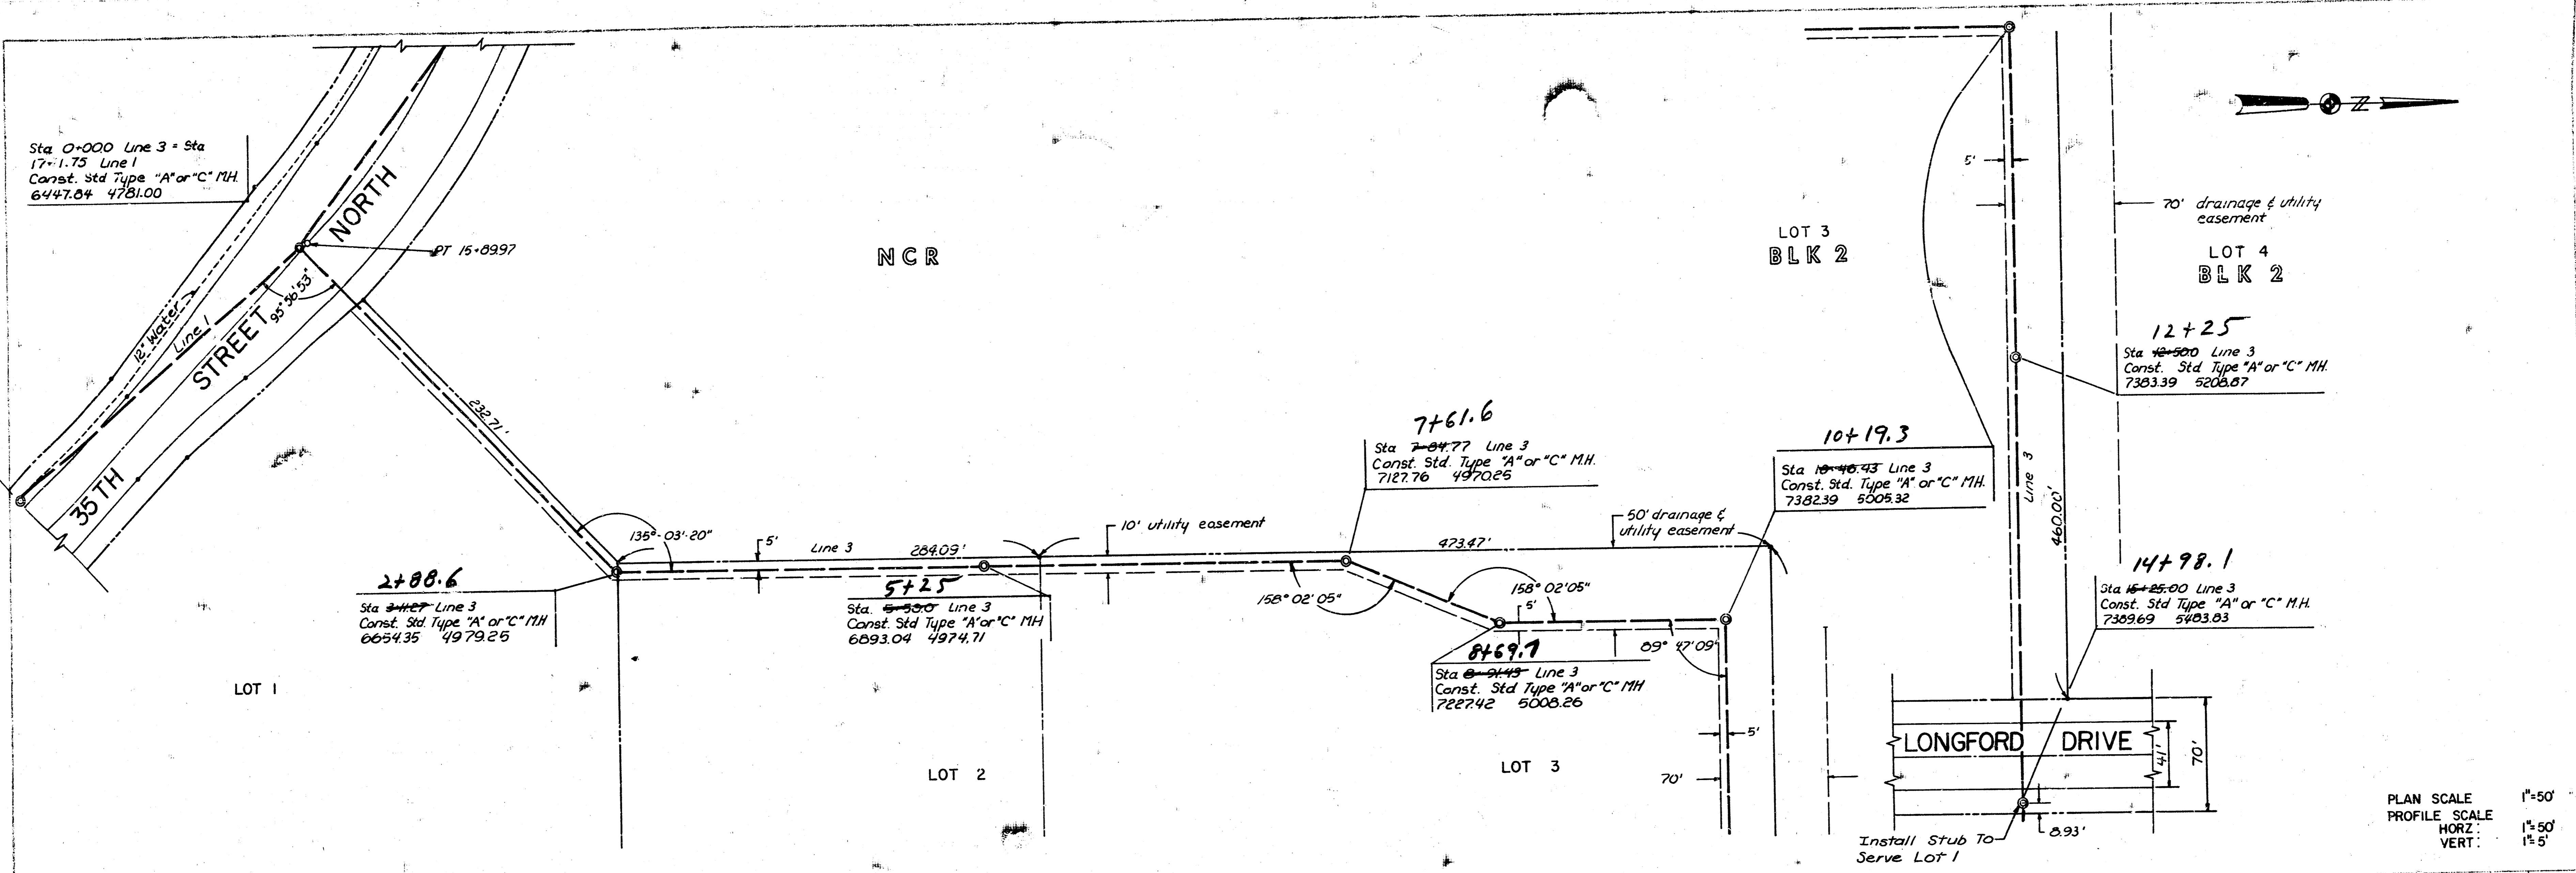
PLAN - PROFILE & P.R. STANDARD
